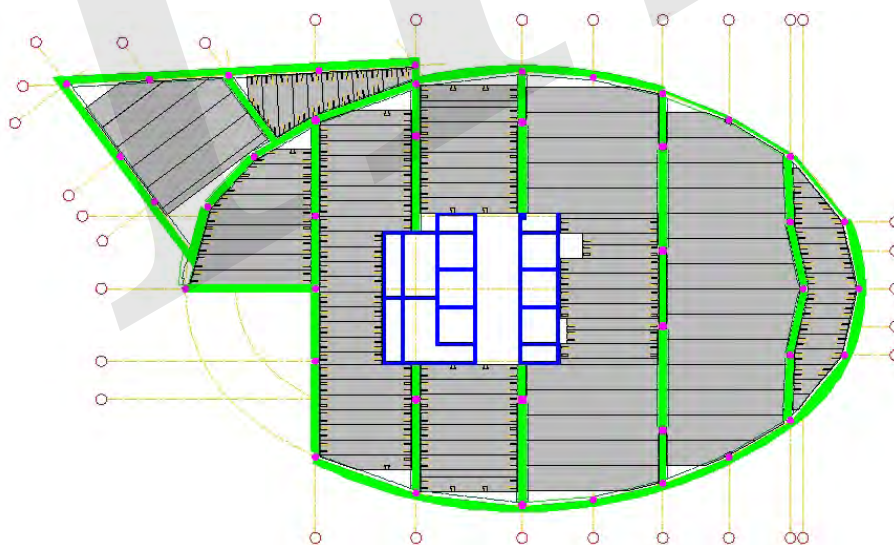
Non regular external building edges but ideal for a precast solution due to repetition at each floor level, Central Plaza, Brussels (courtesy of Ergon Structural Concrete).
